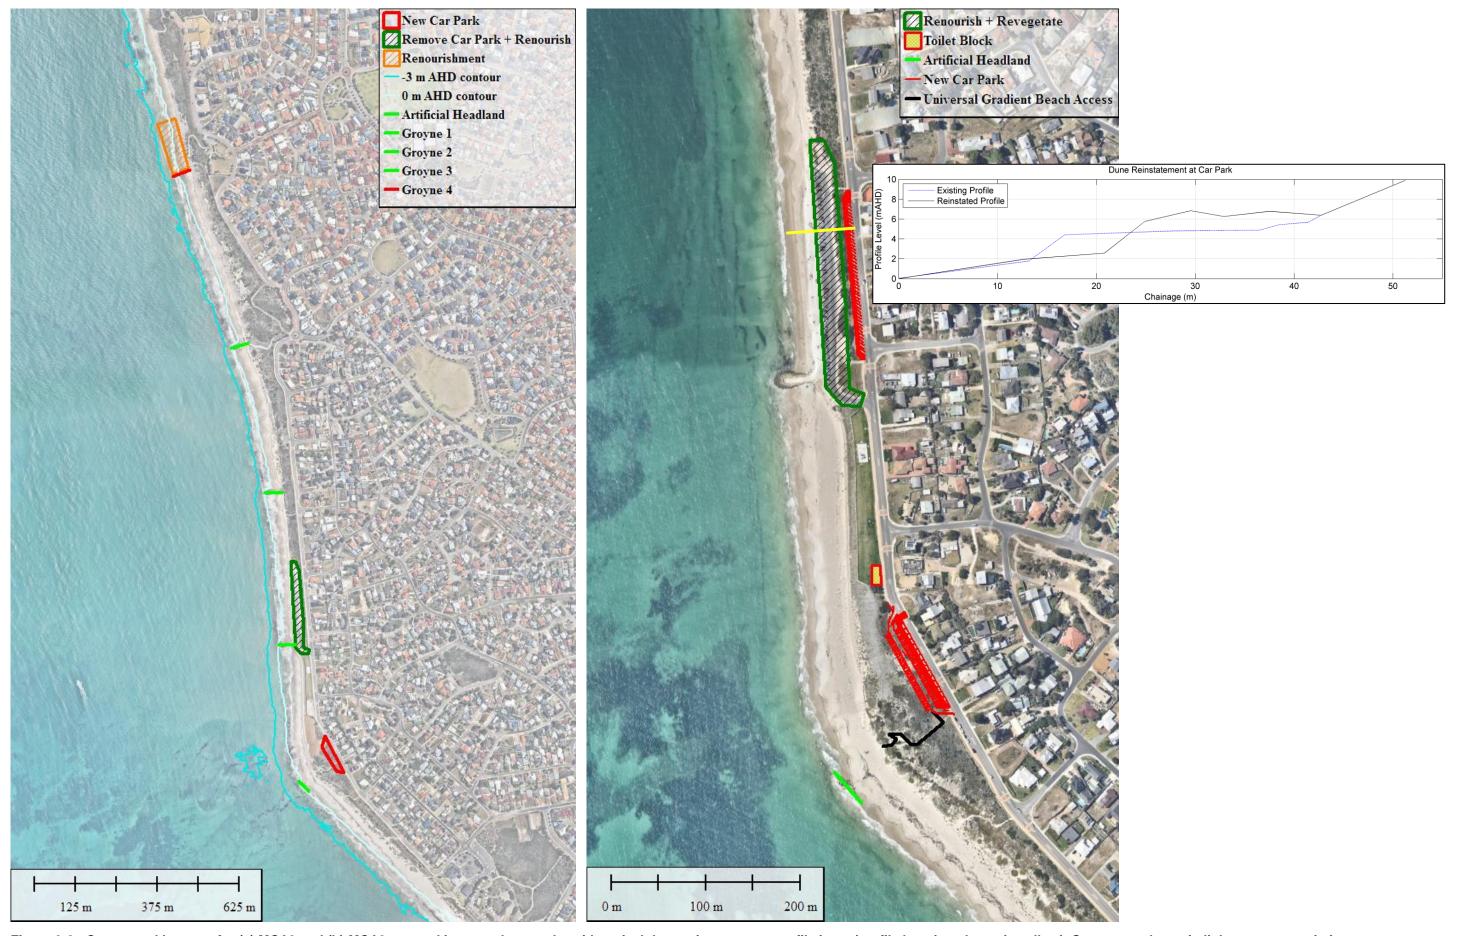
Conceptual Layouts for (a) MCA3 and (b) MCA3 zoomed in around car parks with typical dune reinstatement profile inset (profile location shown in yellow). Structures shown in light green are existing structures.
